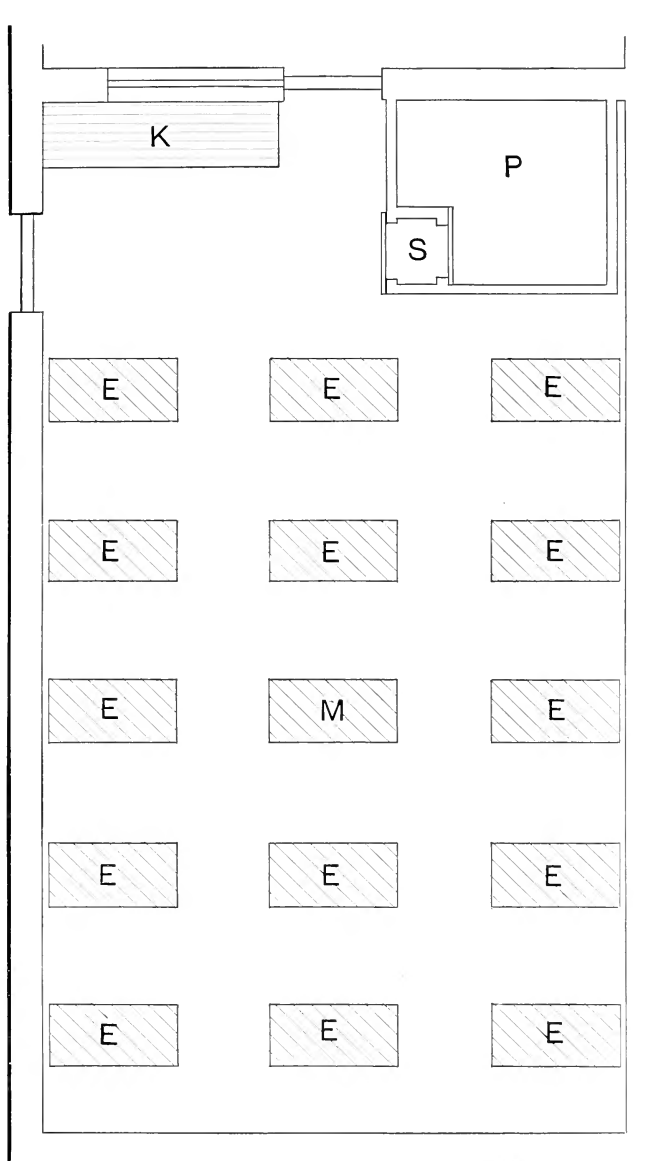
GROUND-PLAN OF EXPERIMENT GREENHOUSE.
